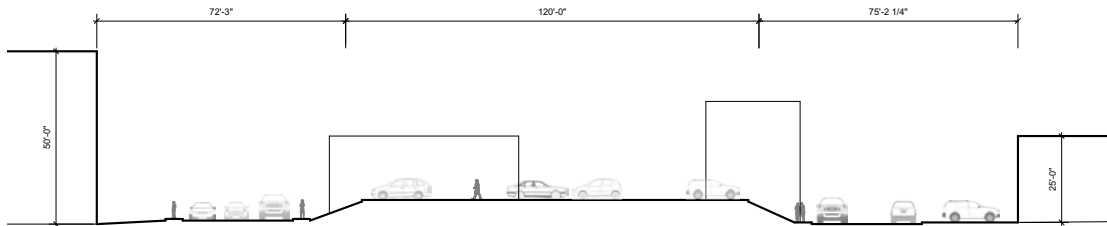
Existing Site Section through Harvard Street and Hobart Place
